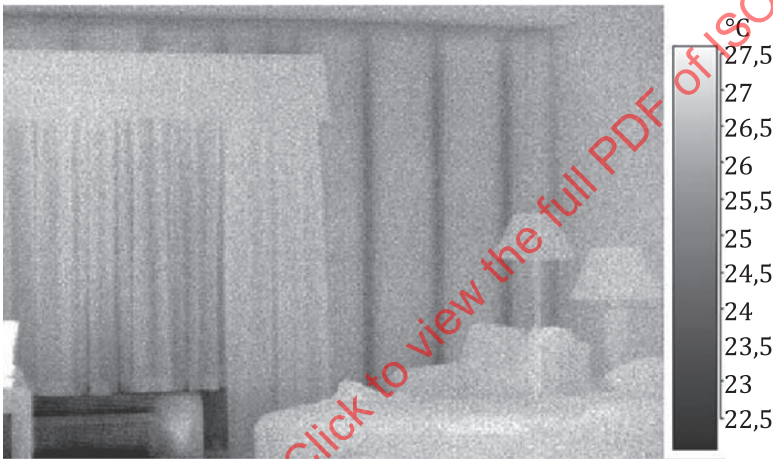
Wall — Insulated stud wall with good construction — Qualitative illustration of heat loss
